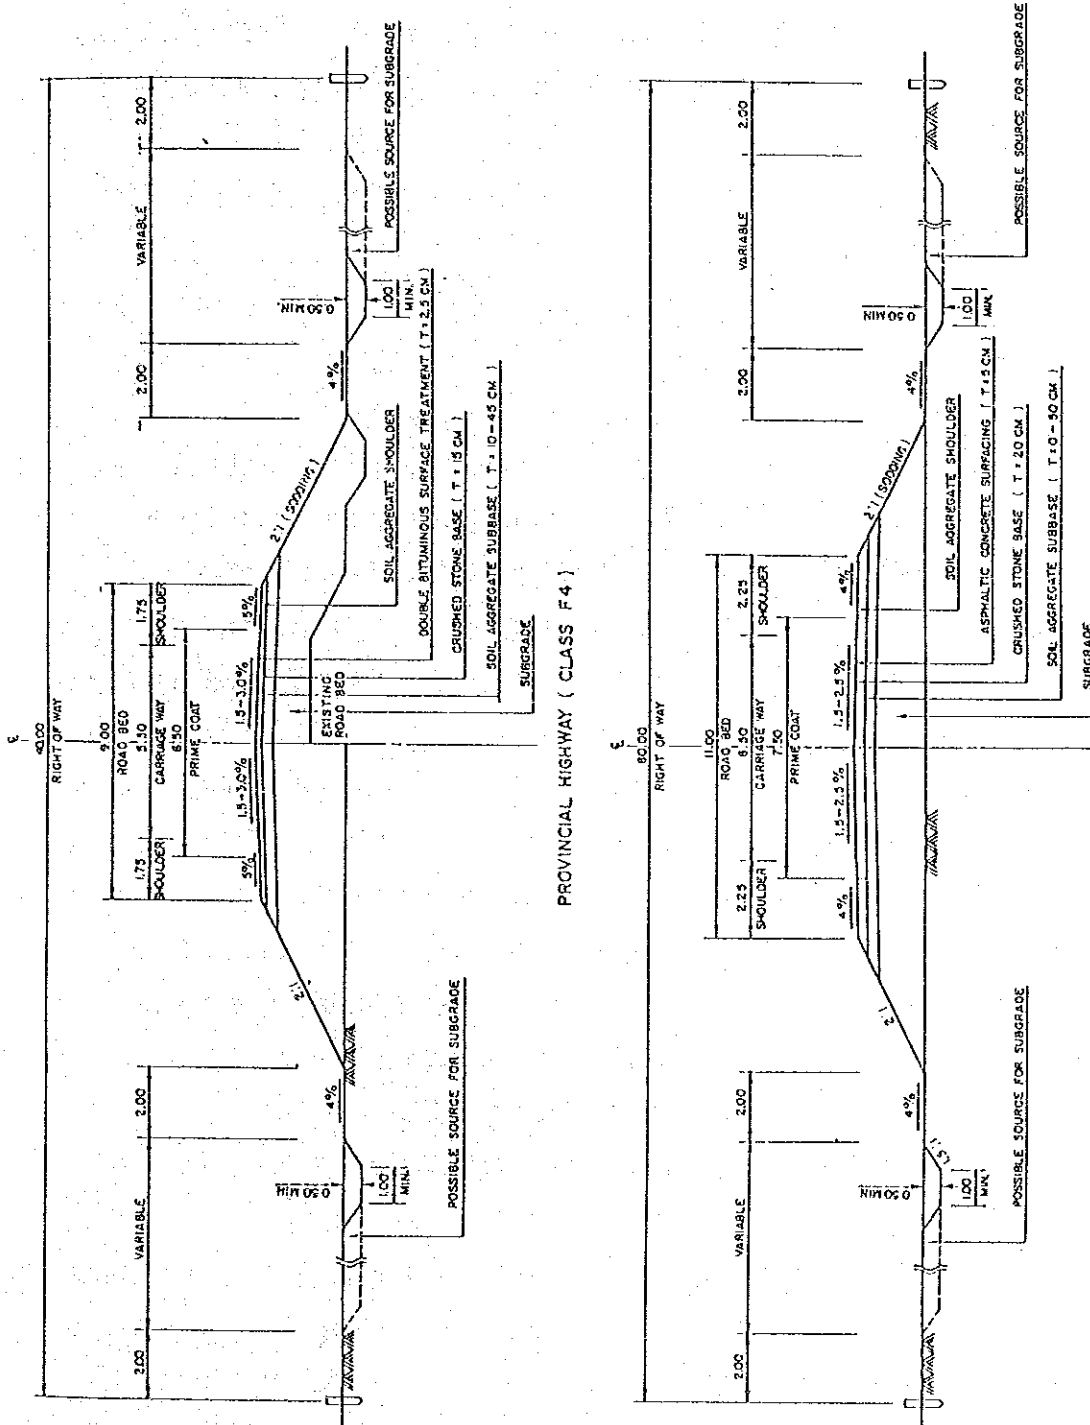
TYPICAL CROSS SECTIONS
